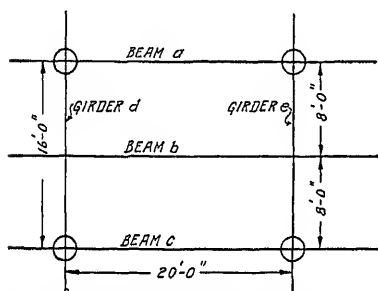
Skeleton Outline of Floor Panel Showing Slab, Beam, and Girder Construction
